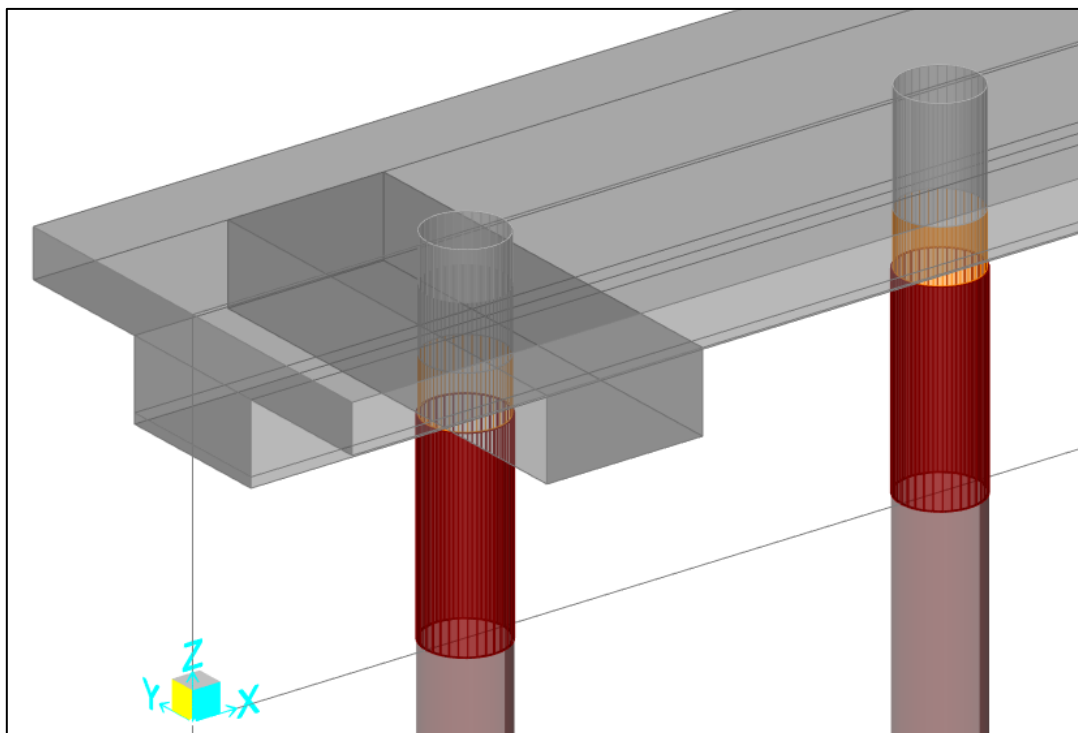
Superstructure and beams modeling in SAP2000, extruded view.
